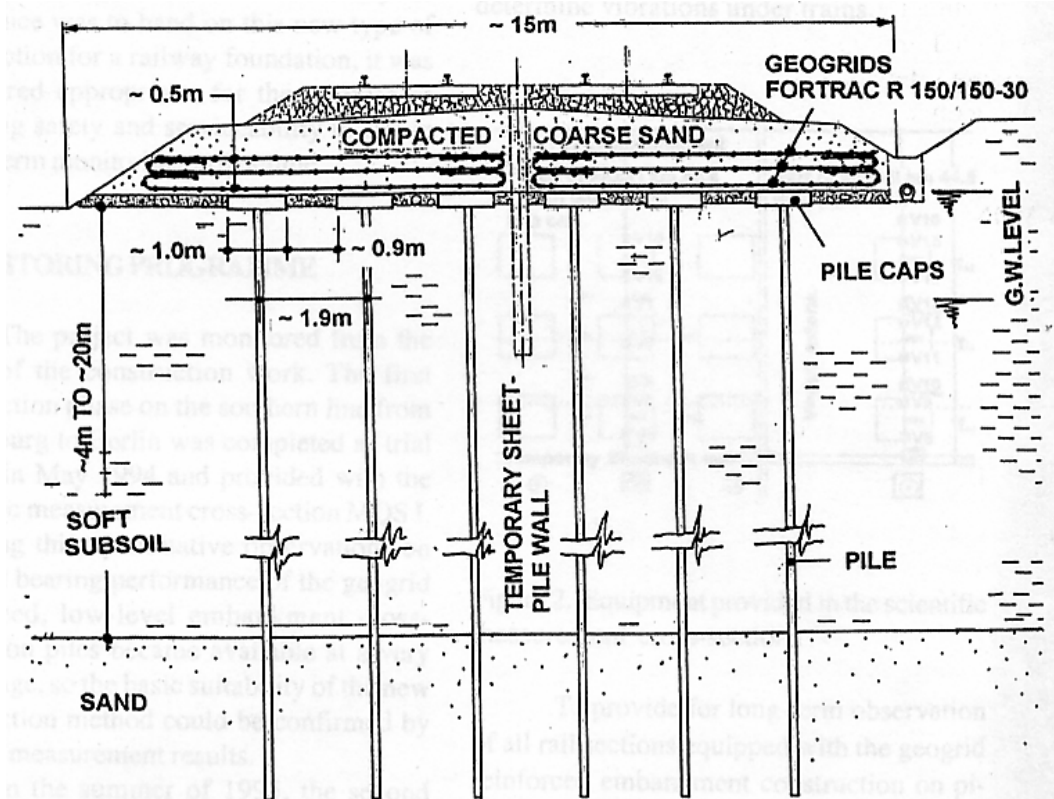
Railway on Geogrid-Reinforced and Pile-Supported Embankment (Alexiew and Gartung, 1999)
